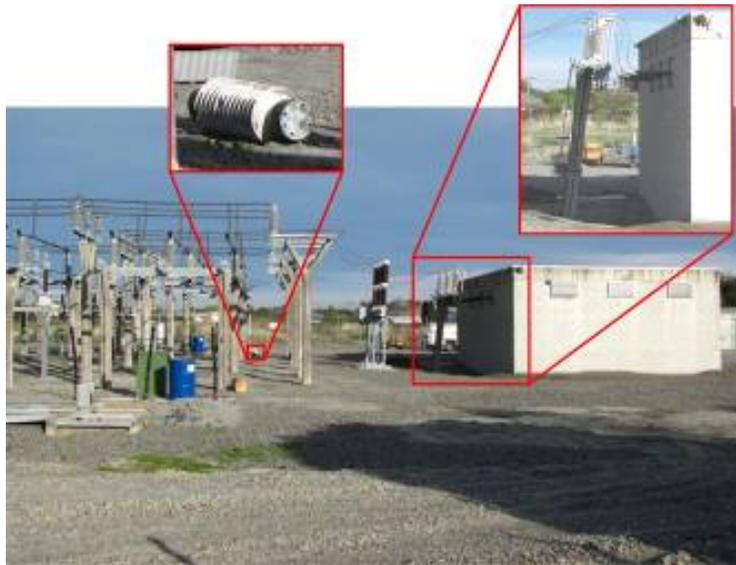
Damage from soil liquefaction at Pages substation. The details show a damaged bushing (left) and tilted supporting structure at the conductors entrance to the transformer building (right) which had experienced a small settlement.
